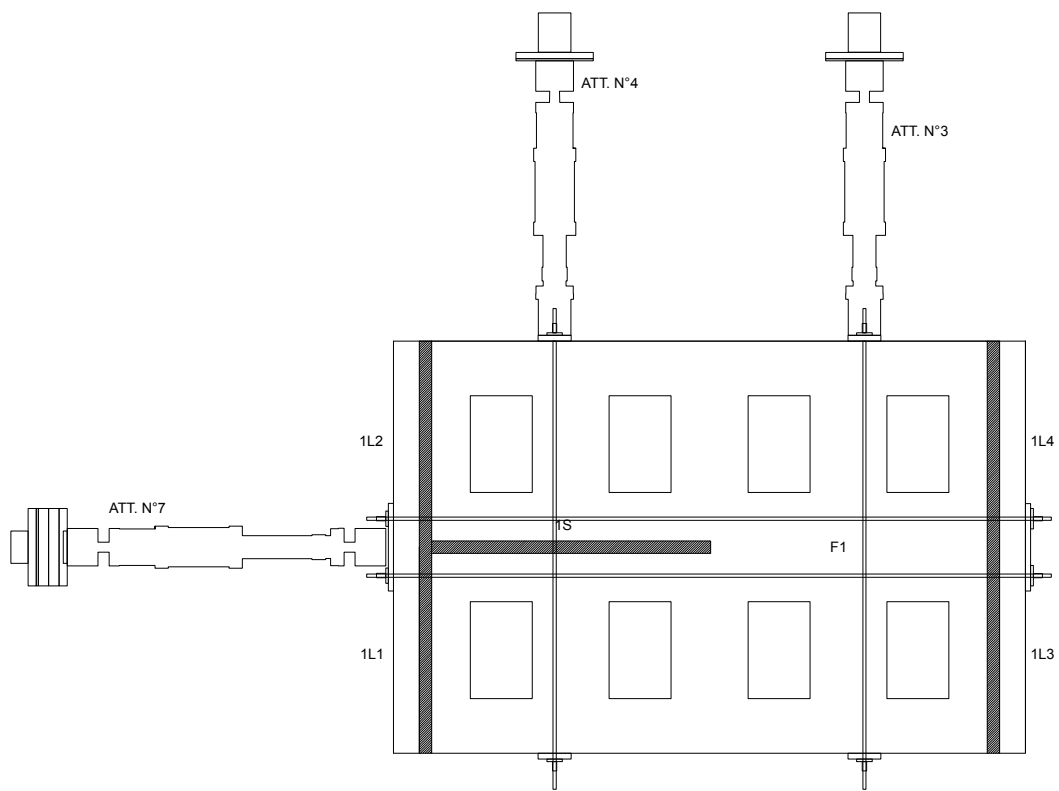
Schematic of the experimental setup – top view of the first floor slab.
